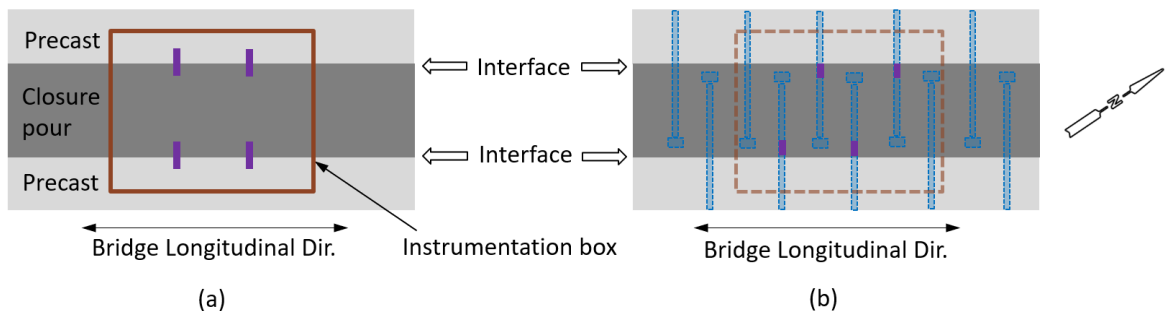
Current project (Phase 3) locations of concrete and steel strain gages
